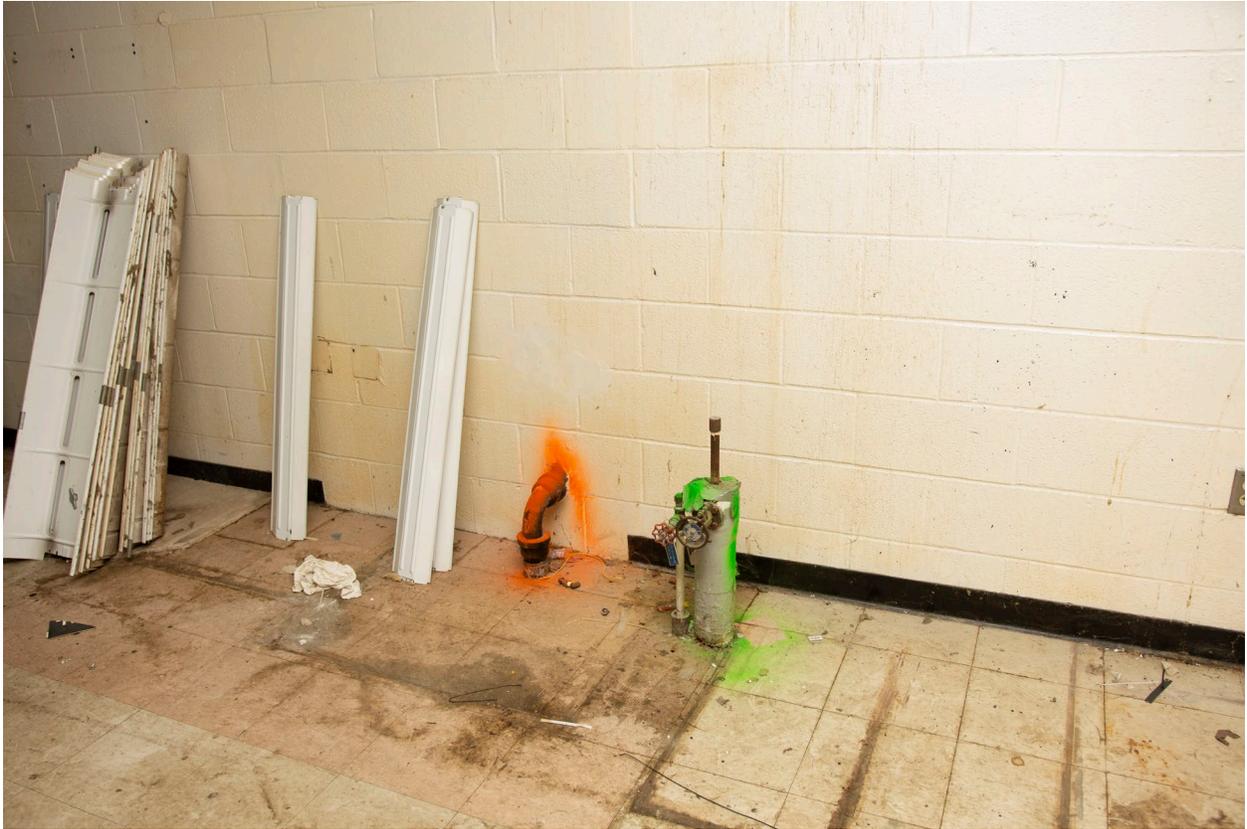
Roof Drain Piping Painted Orange to Identify Potential Lead Joints and Green Paint on Pipe Wrapping Indicating Non-asbestos Materials (9/2019)
